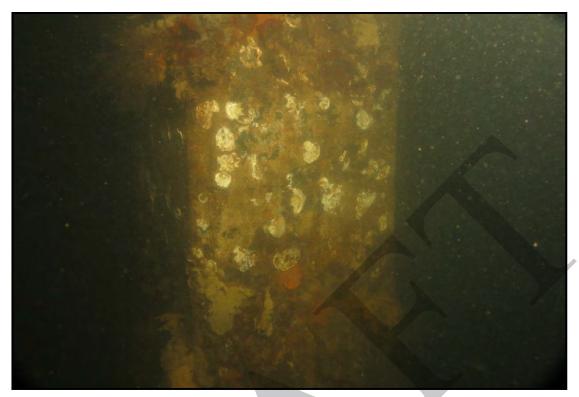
Typical Level II inspection location on a prestressed pile.
